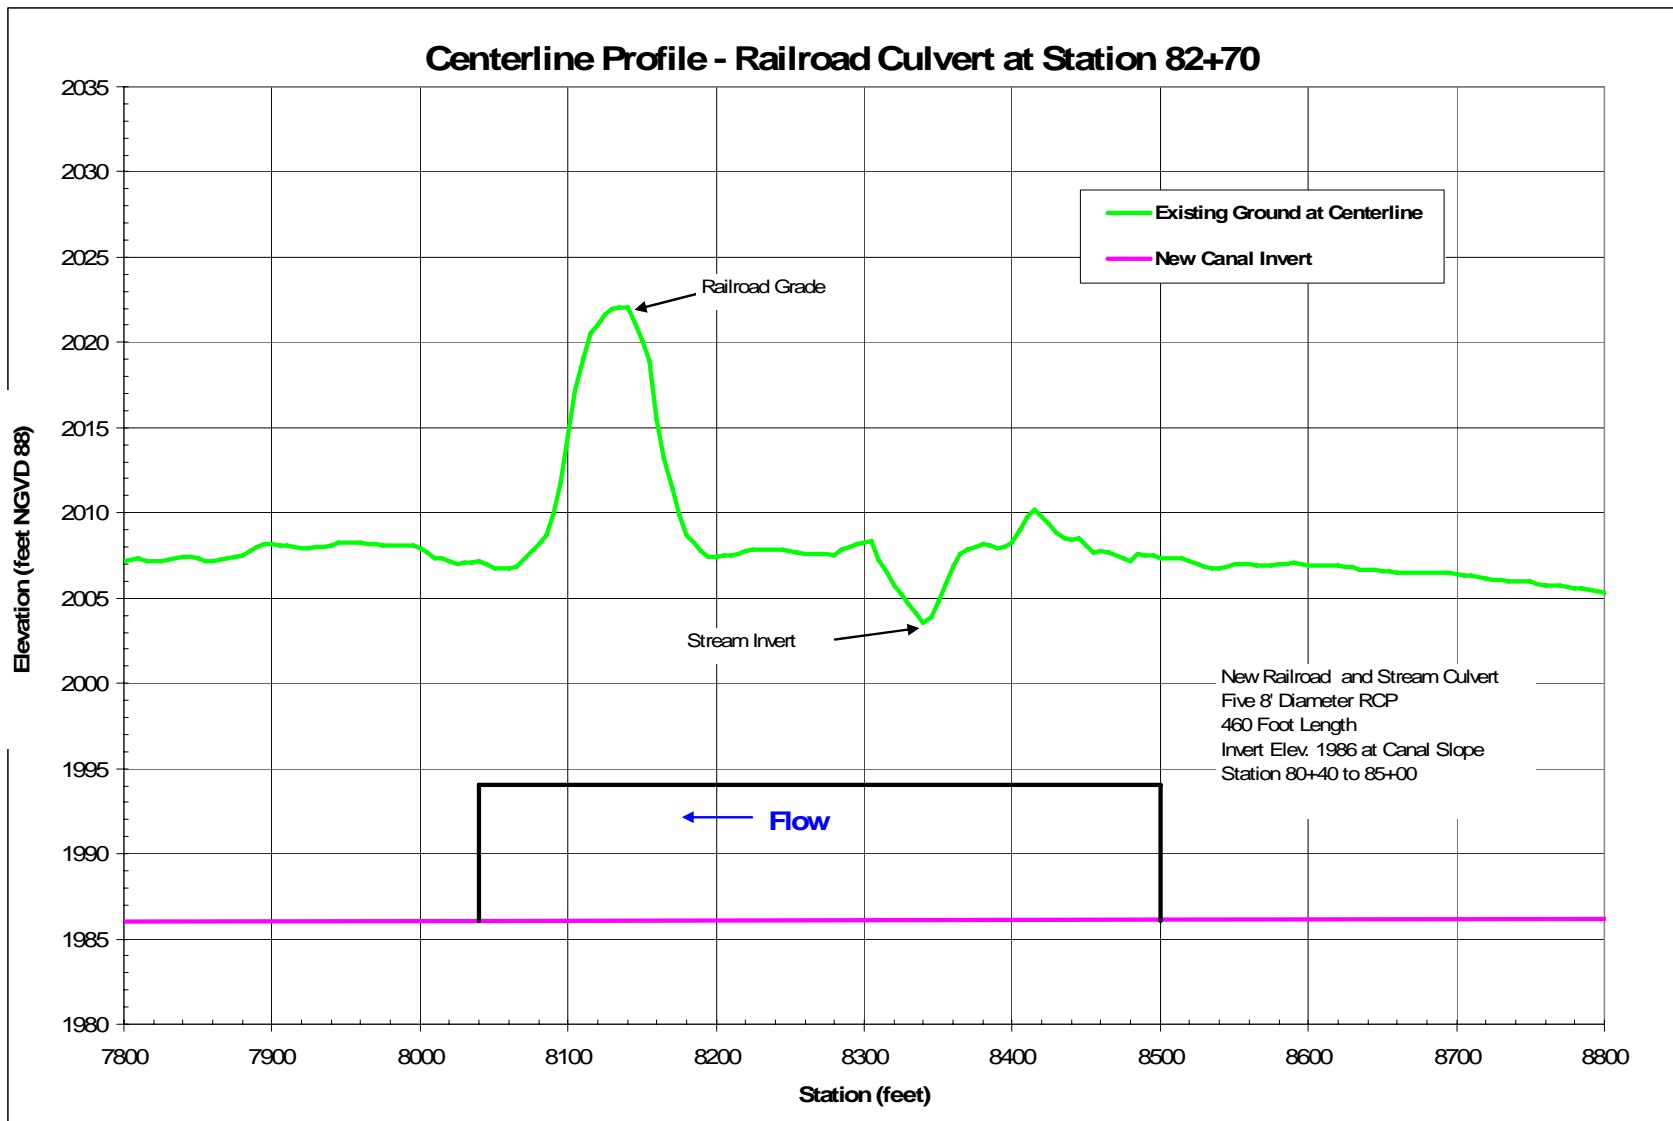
Centerline Profile – Railroad Culvert at Station 82+70
